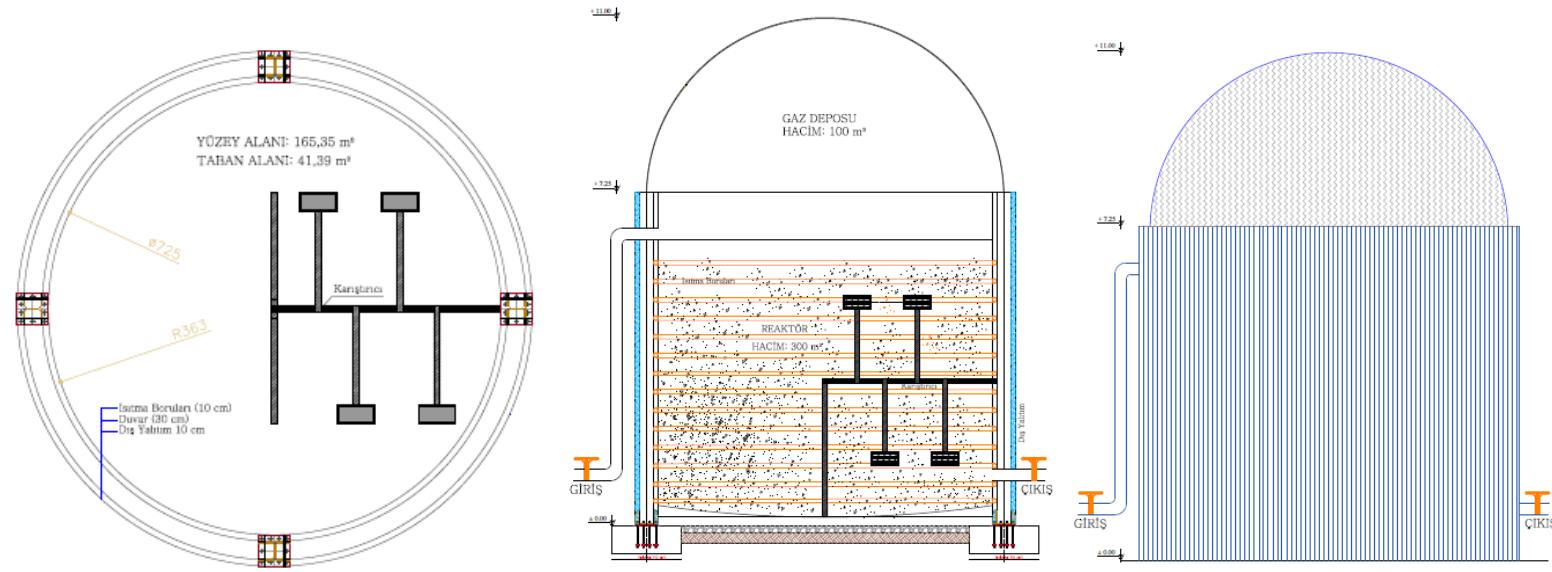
Floor plan, cross-section and side view of pilot facility designed for 250 bovine manure capacity (Scale: 1/200)
